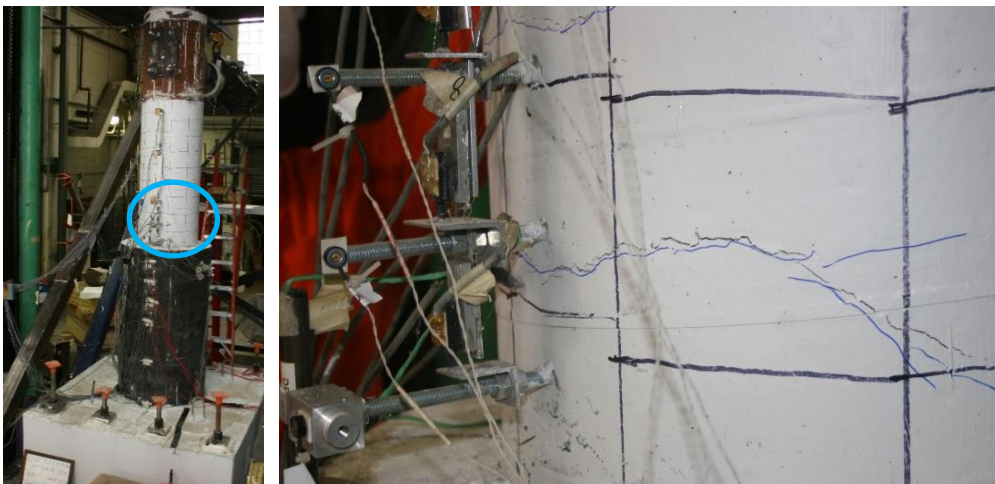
Specimen 30-21-R Column Northern Face crack at 1.75% Drift
